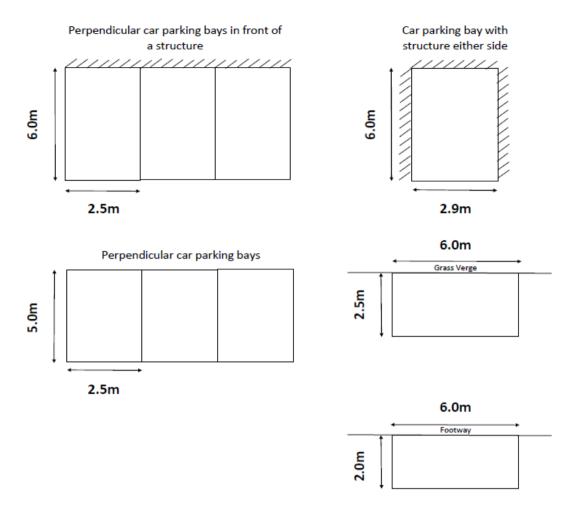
The minimum dimensions for standard car parking spaces in different layouts..
